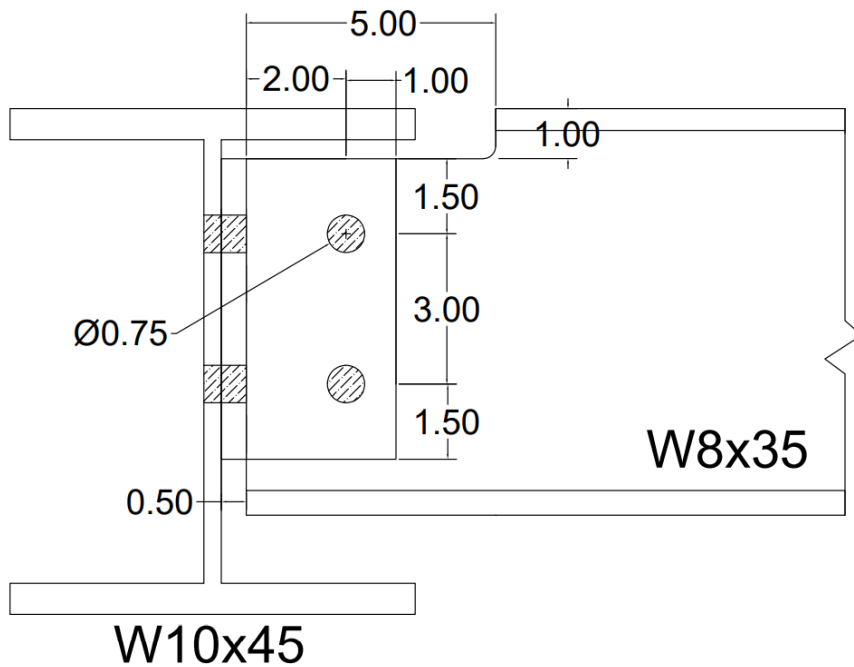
Simple connection of roof girder to roof beams in the north section.
